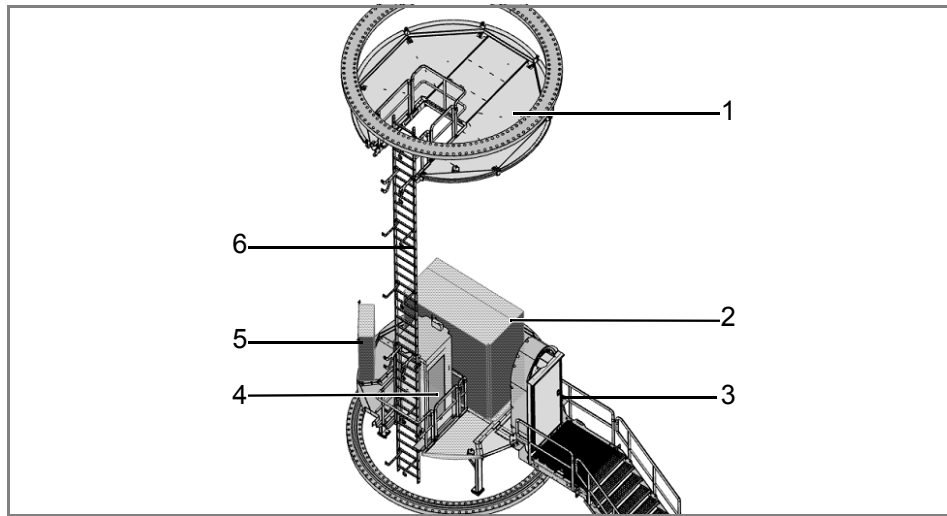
Overview of installations in the bottom section of the steel tube tower
